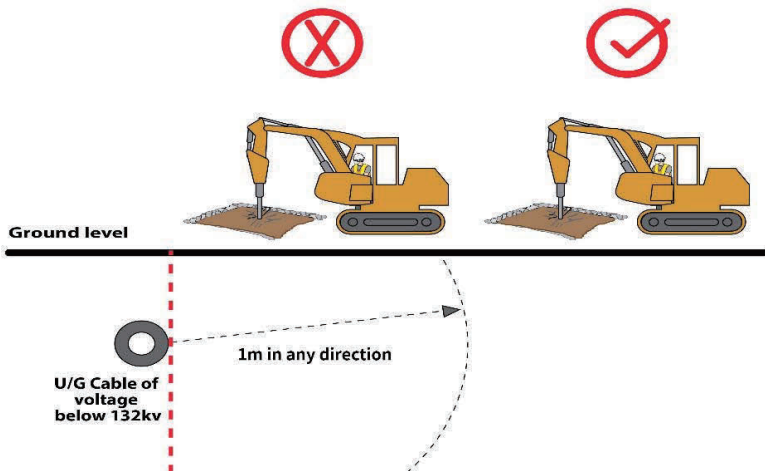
Minimum safe working distance between U/G cables of voltage below 132kV and the point where mechanical excavators are used
